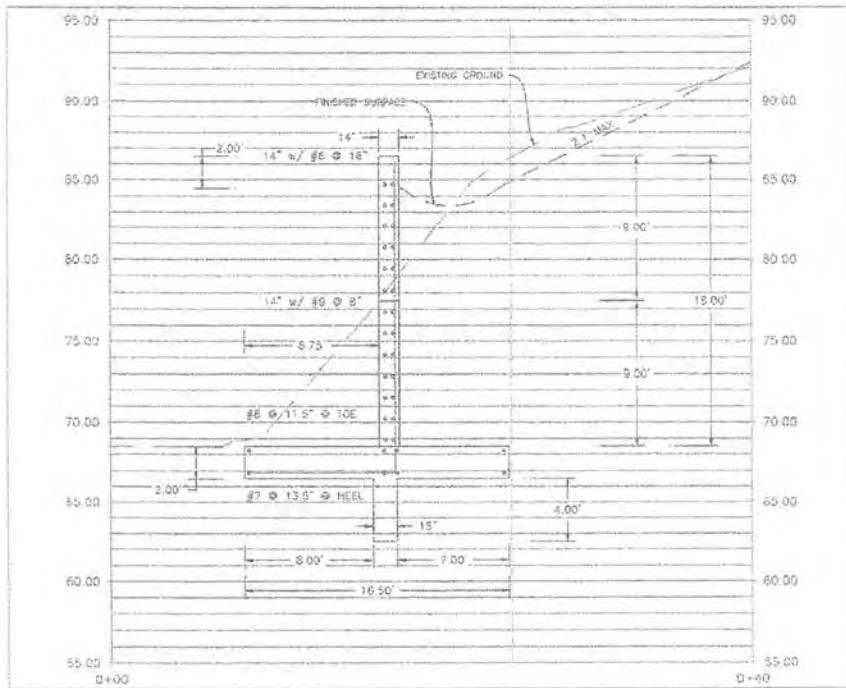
Proposed cantilever retaining wall location relative to existing structures.
